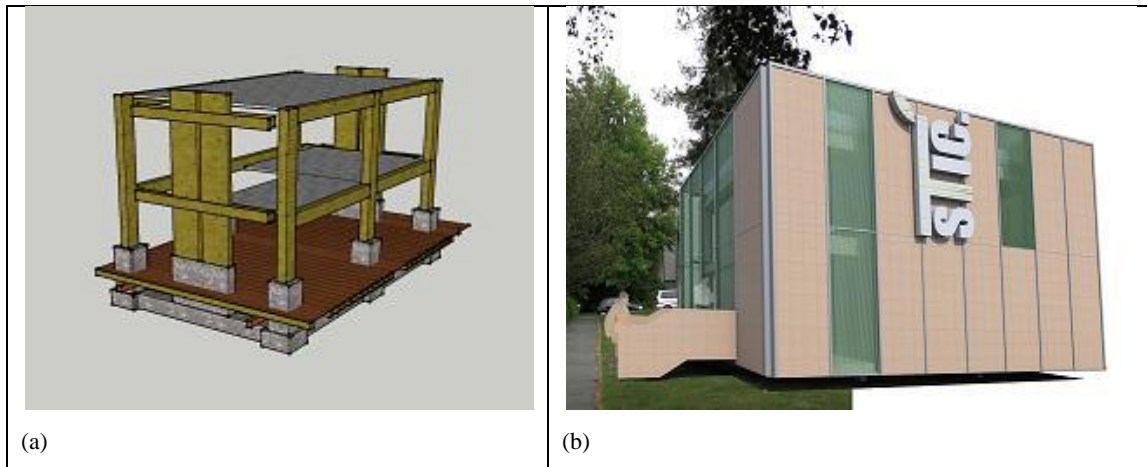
(a) TCC floor are placed (b) Architectural Impression of the completed STIC building-(Courtesy from STIC Ltd. and Thom Craig Architects)
